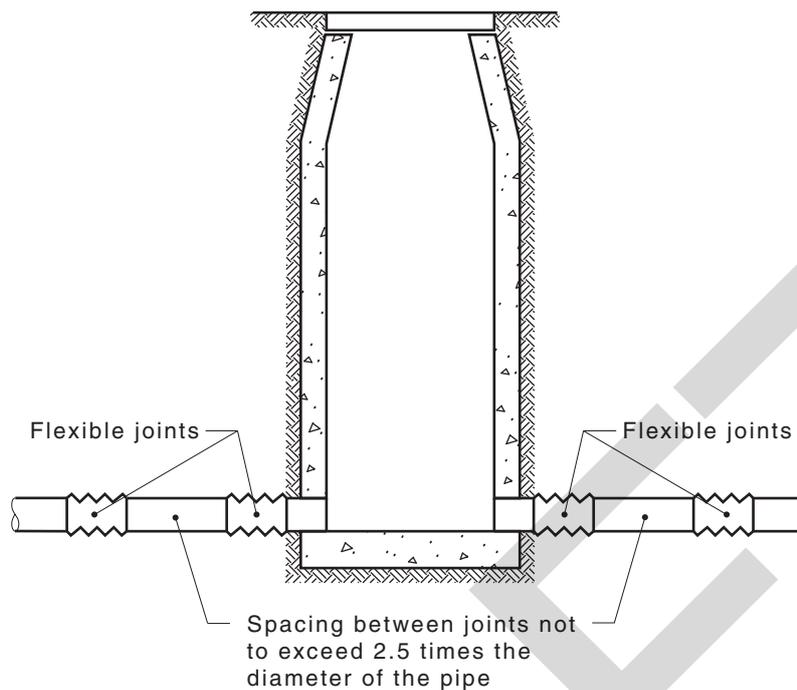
TYPICAL INSTALLATION OF FLEXIBLE JOINTS INSTALLED IN INSPECTION CHAMBERS OR SIMILAR STRUCTURES
